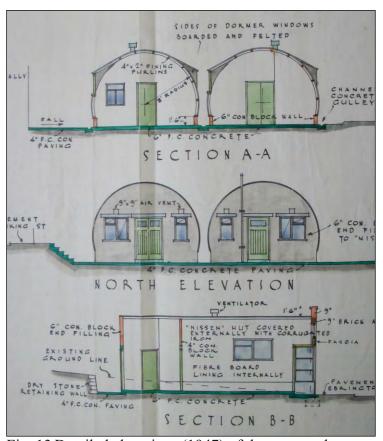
Detailed elevations (1947) of the proposed 'Nissen' Hut shops.
